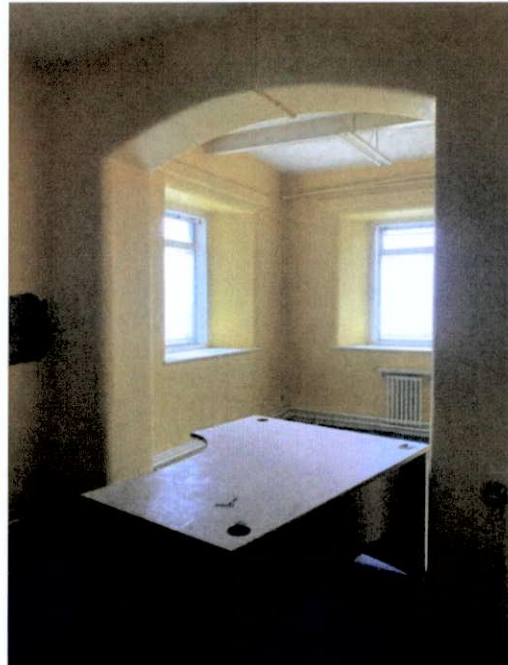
Arched openings supporting columns in Chapel above. Contemporary windows.
